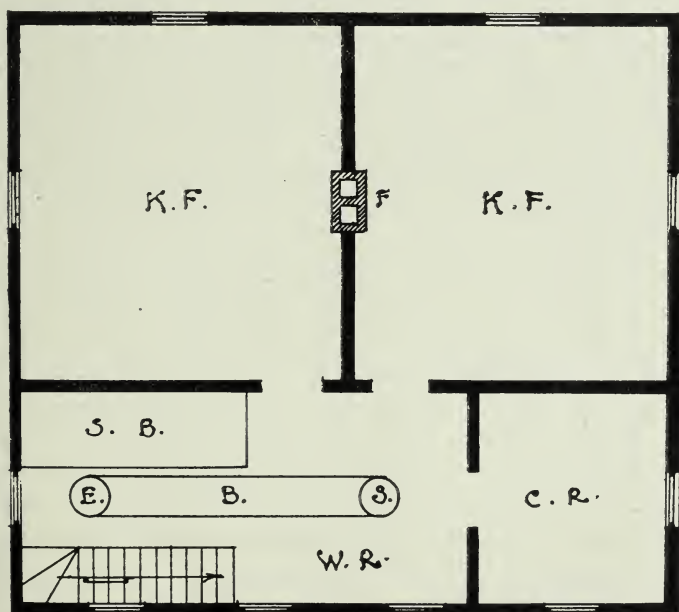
Fig. II. Two-kiln evaporator, second-floor plan. K.F., kiln floors. W.R., work room. C.R., curing room. S.B., storage bin. E., elevator. B., bleacher. S., slicer. F., chimney of furnaces.
